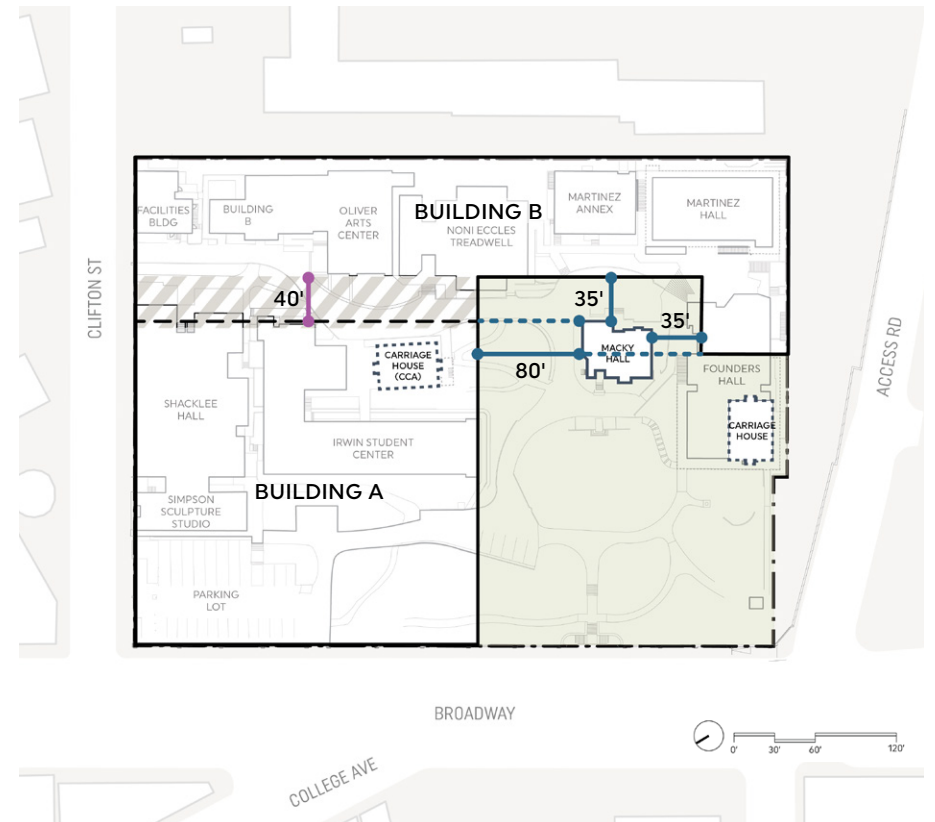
Building A and Building B buildable area boundaries over existing siting
